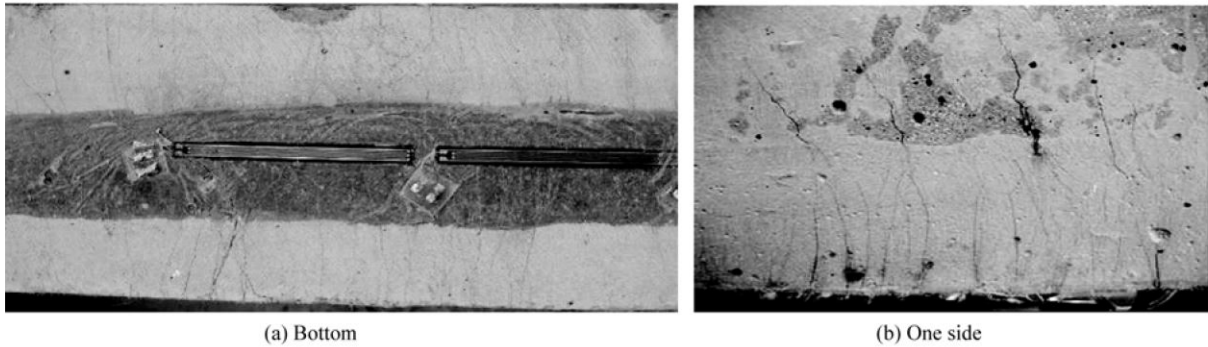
Crack opening in UHTCC50 specimen [7]
